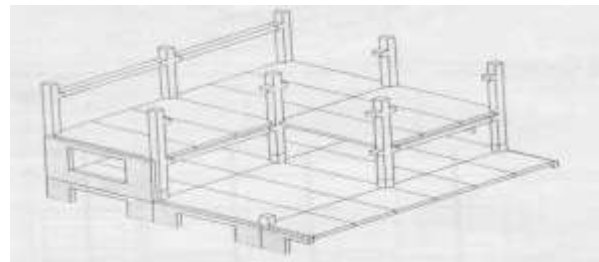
Diagram of a skeleton structure consisting of prefabricated columns and beams
